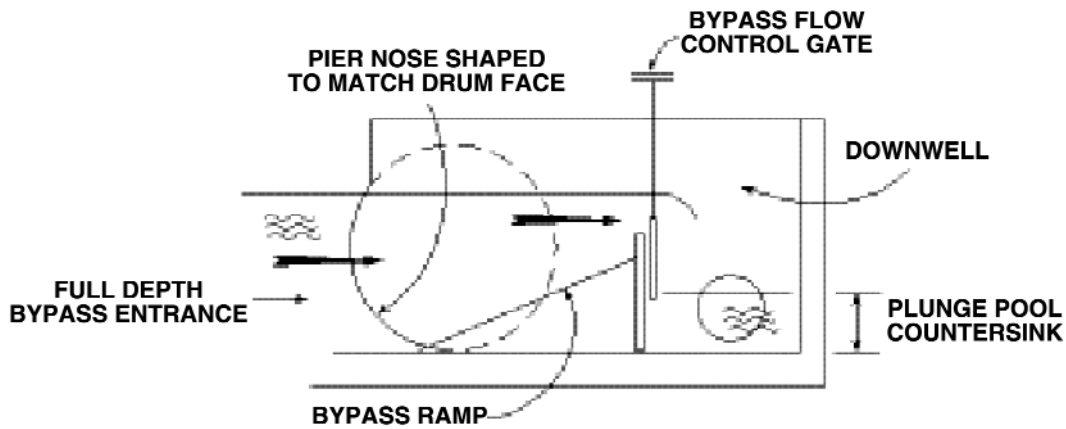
Elevation View of Fish Bypass System at Drum Screen Installation (WDFW, 2000)
